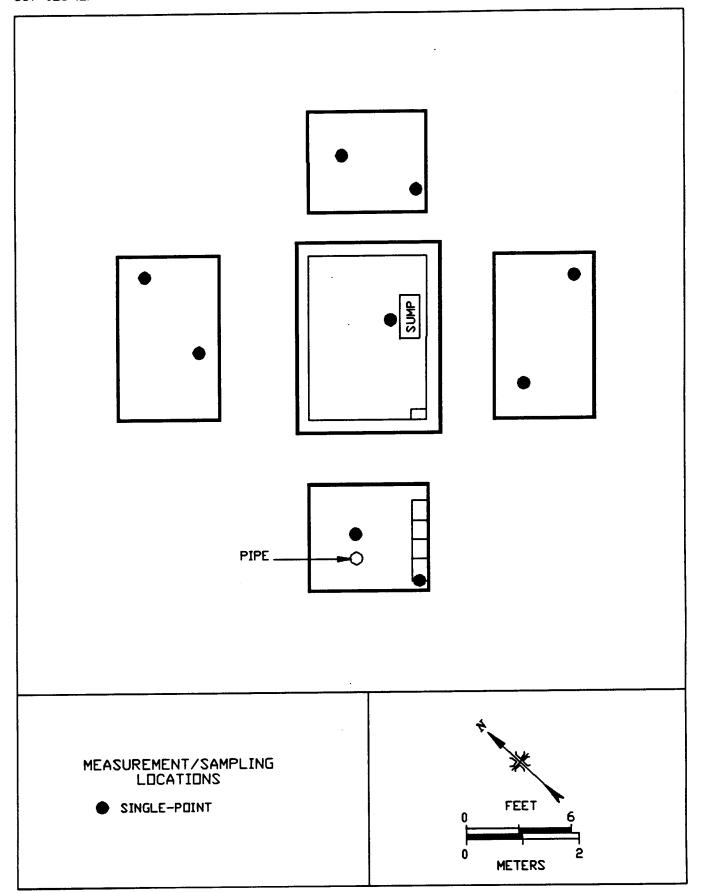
Building 023, Rad-Waste Tank Vault - Measurement and Sampling Locations
